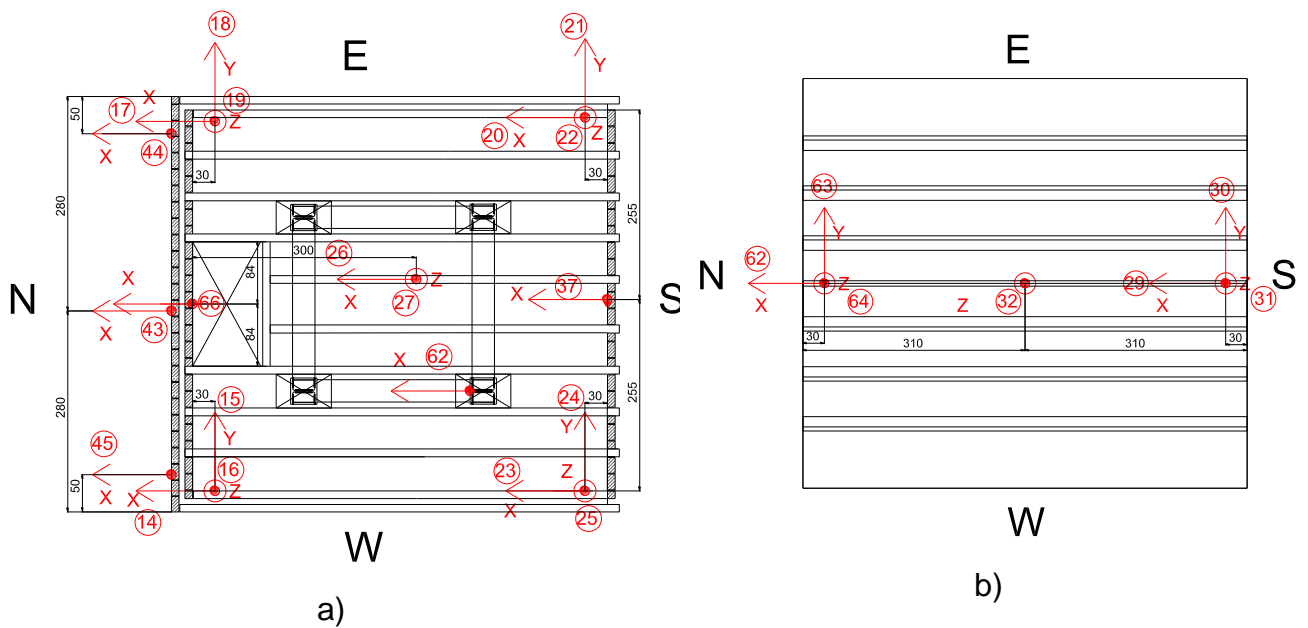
Accelerometer plan views: a) second-floor level (timber diaphragm); b) roof level.
